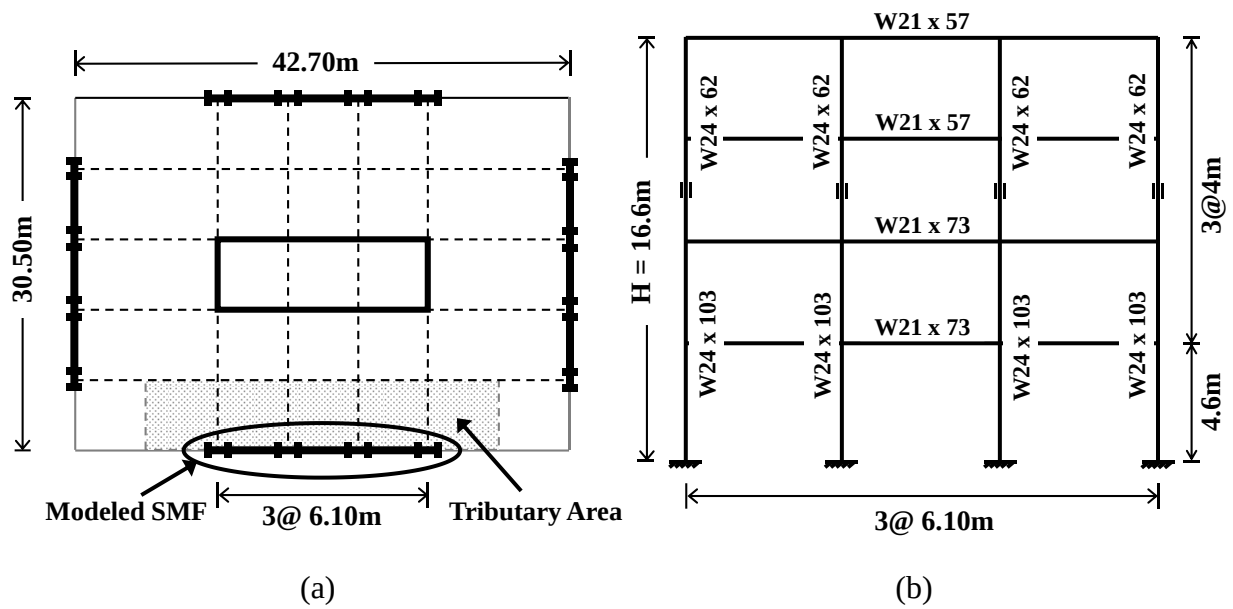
(a) Plan view of the four-story building; (b) elevation view of the modeled SMF.
